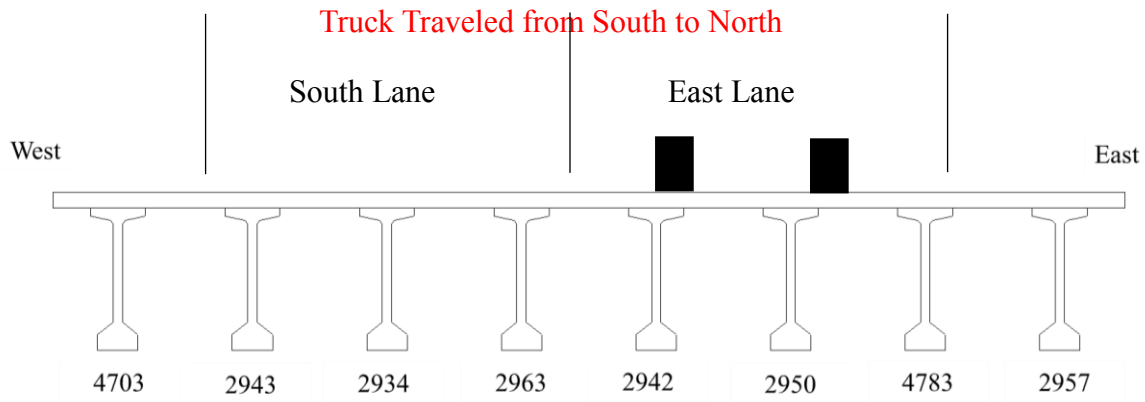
Configurations of trucks on long-span steel girder Bridge 600770
